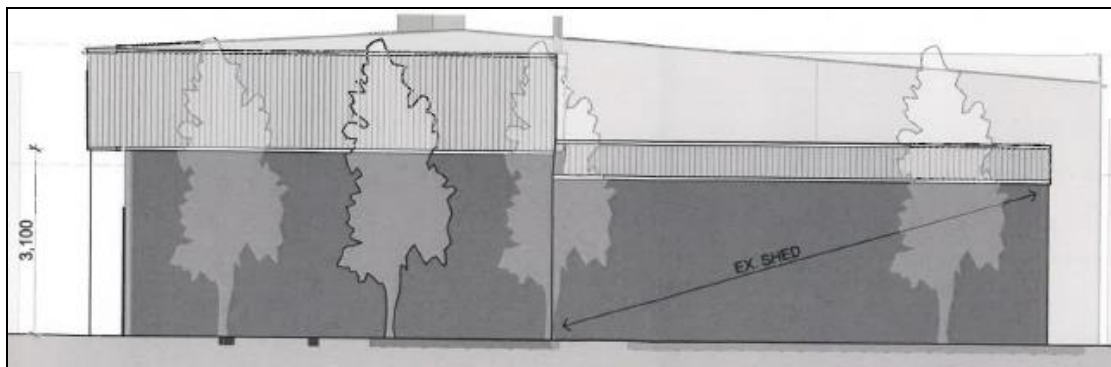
Snapshot of the proposed south-west elevation – planning application PLN-17-314 P2 plans
